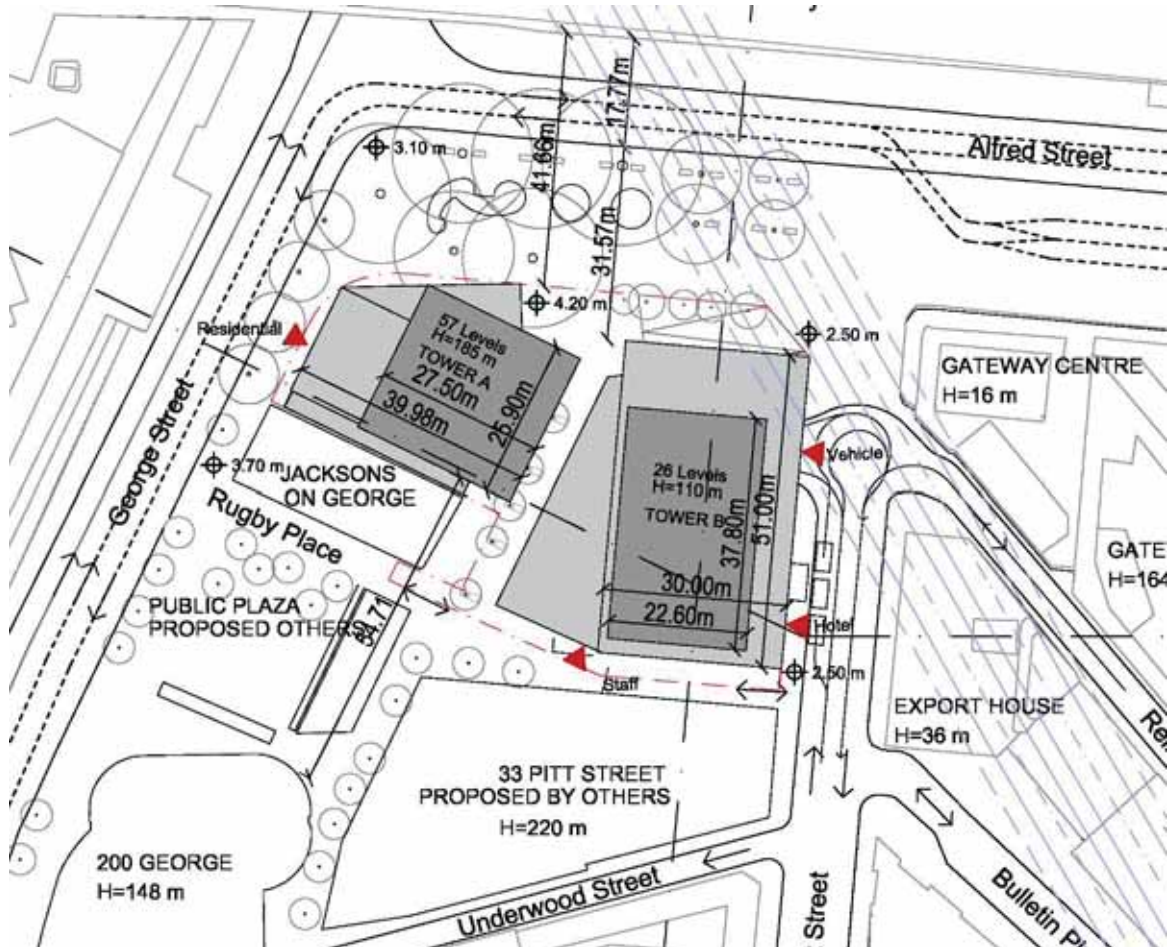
Proposed revised building envelopes (Source: Applicant's RtS)
